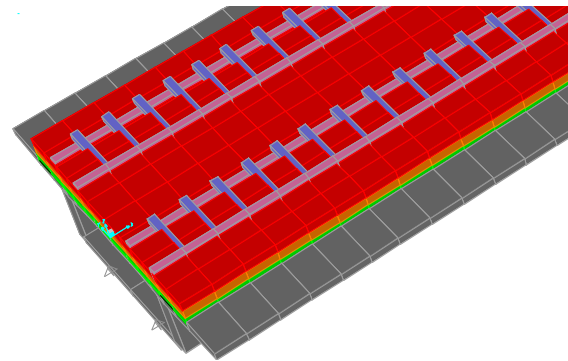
Bridge object with ballast: Green – Tout-venant, Orange – Sub-ballast, Red – ballast, Purple – Sleepers, Pink - Rails
